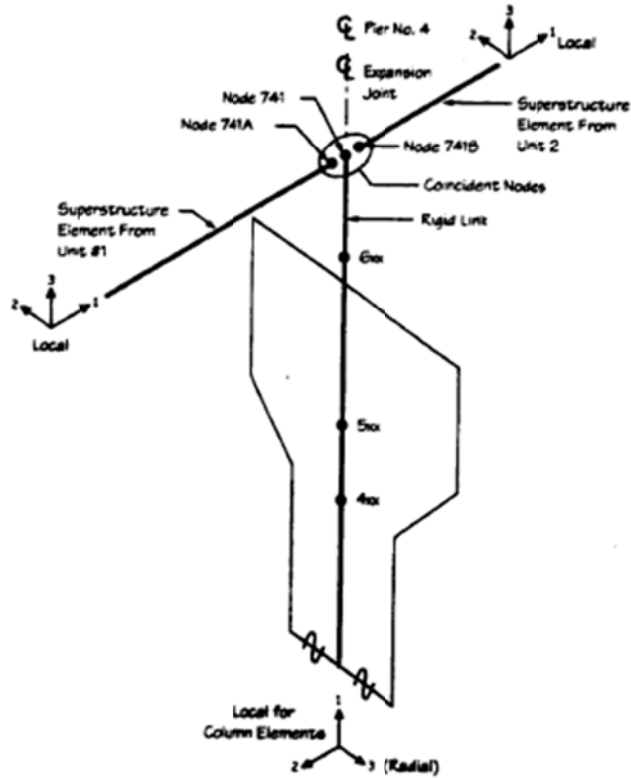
Bridge No. 1 – Details at Pier No. 4 Expansion Joint
